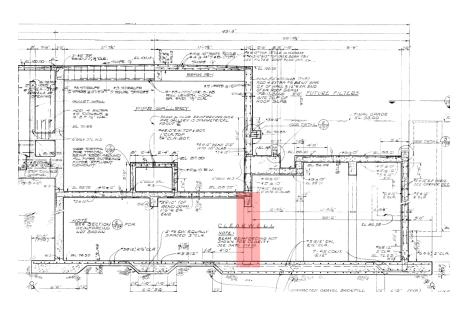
Shear Wall not Continuous to Foundation (Source Drawings: "Water Treatment Plant (A700004)")
